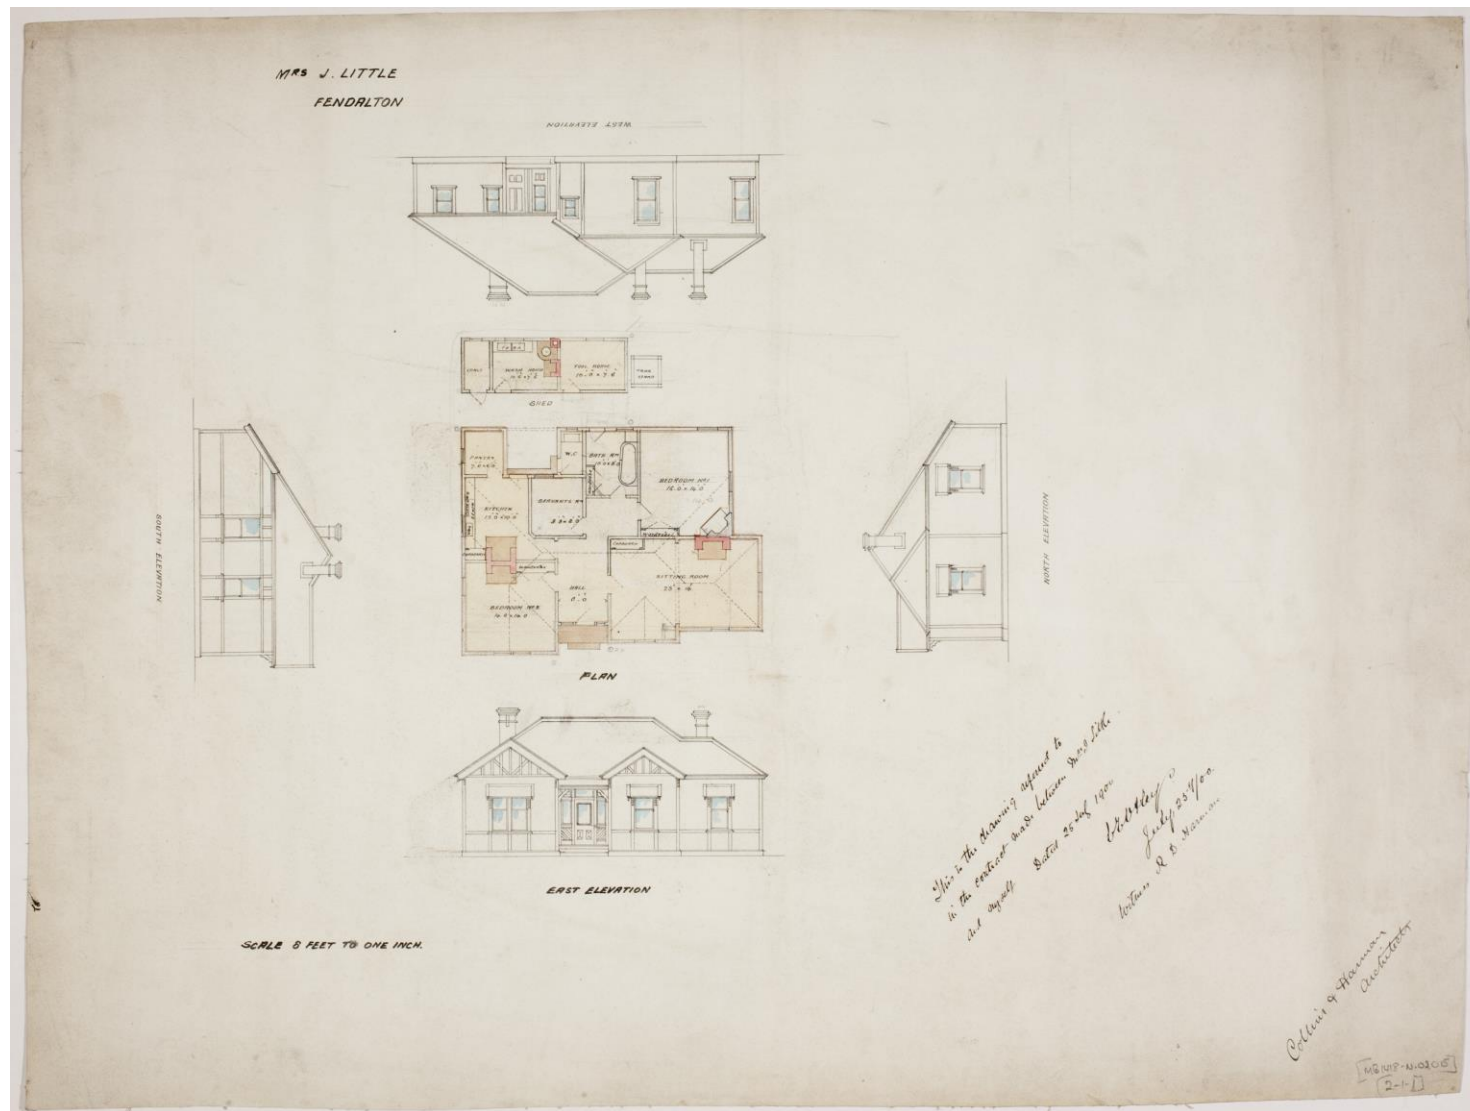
Collins and Harman, Mrs J. Little, Fendalton, plan and elevations (1900).
